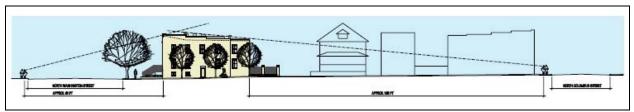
Sight lines of HVAC equipment from North Washington and North Columbus streets.
